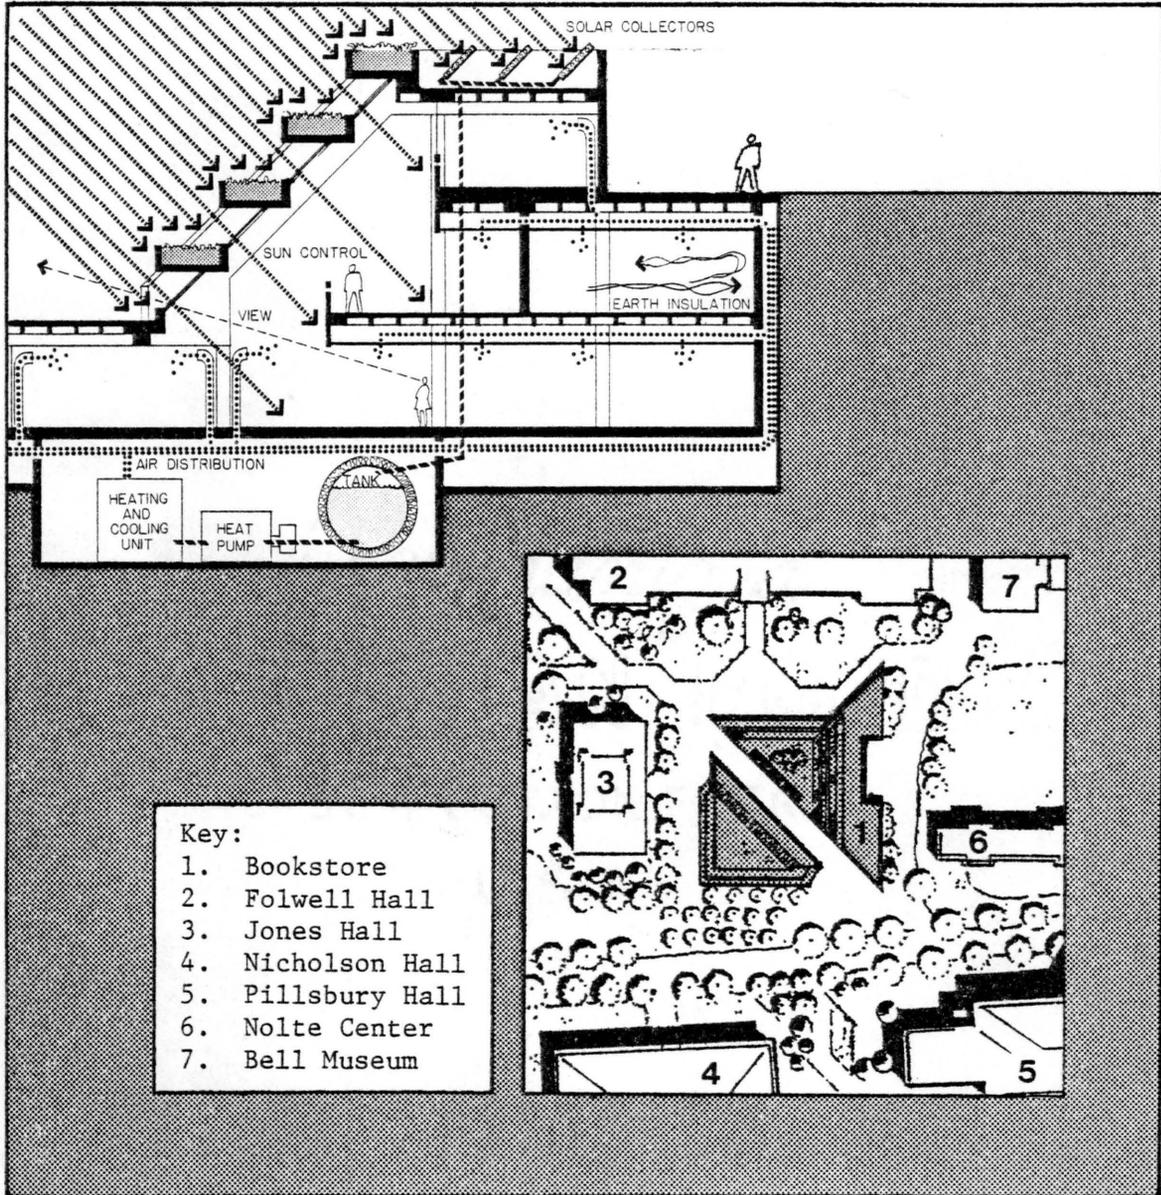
University of Minnesota Bookstore section and plan, Myers and Bennett Architects/BRW
